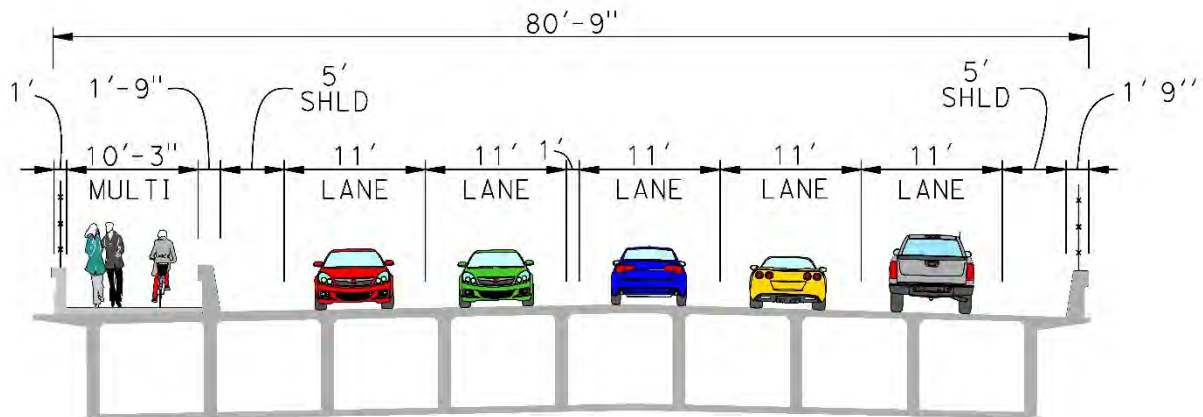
Foothills Boulevard Overhead and Bridge – Existing Configuration
